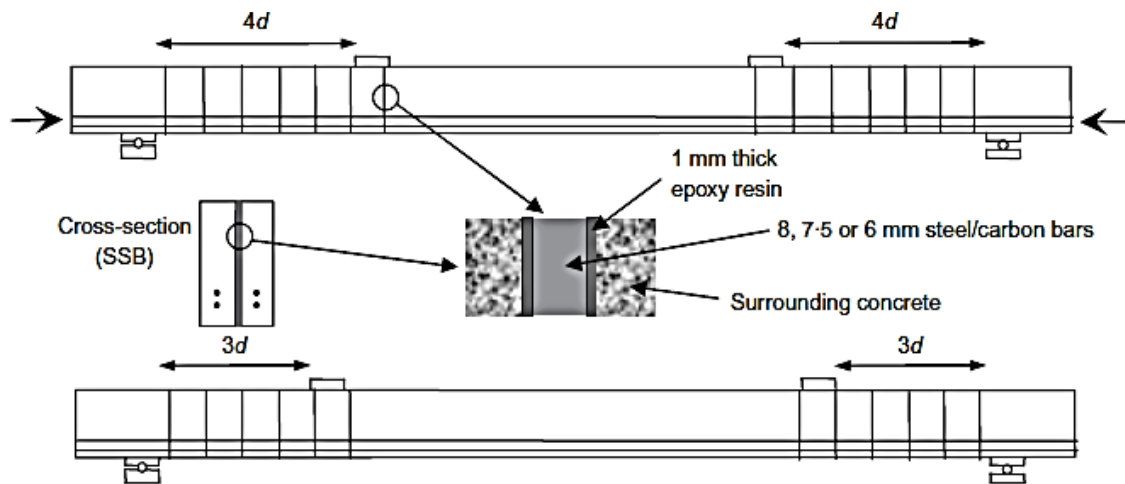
Test layout for the strengthened beams (Valerio et al., 2005)
